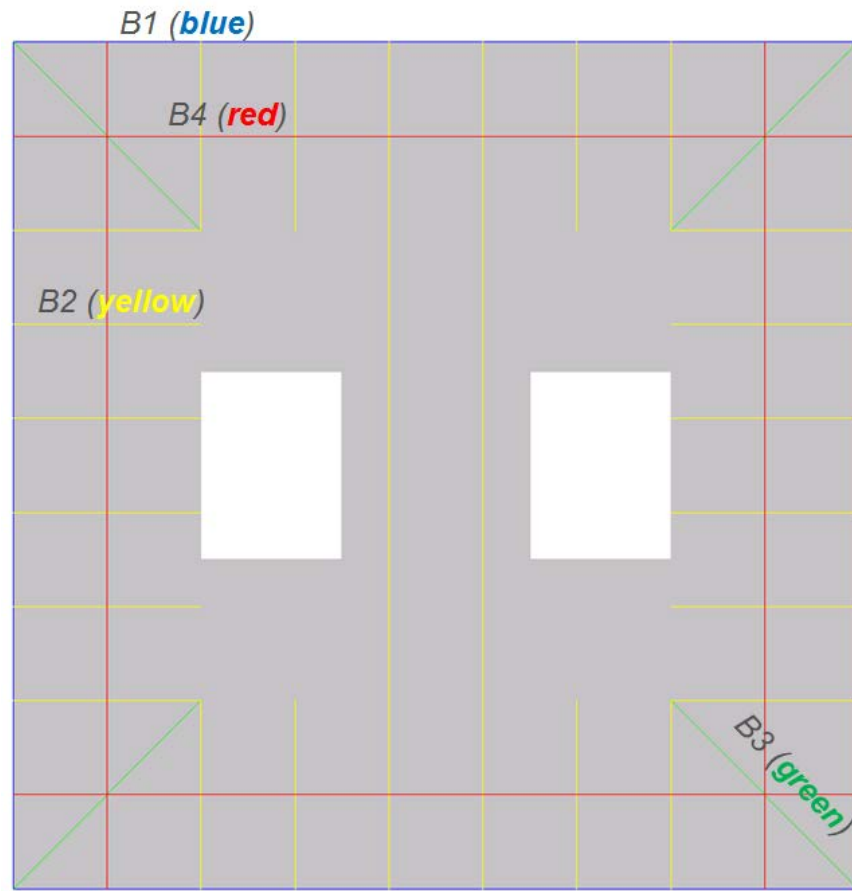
Typical floor plan with beam labels shown in SAP2000.
